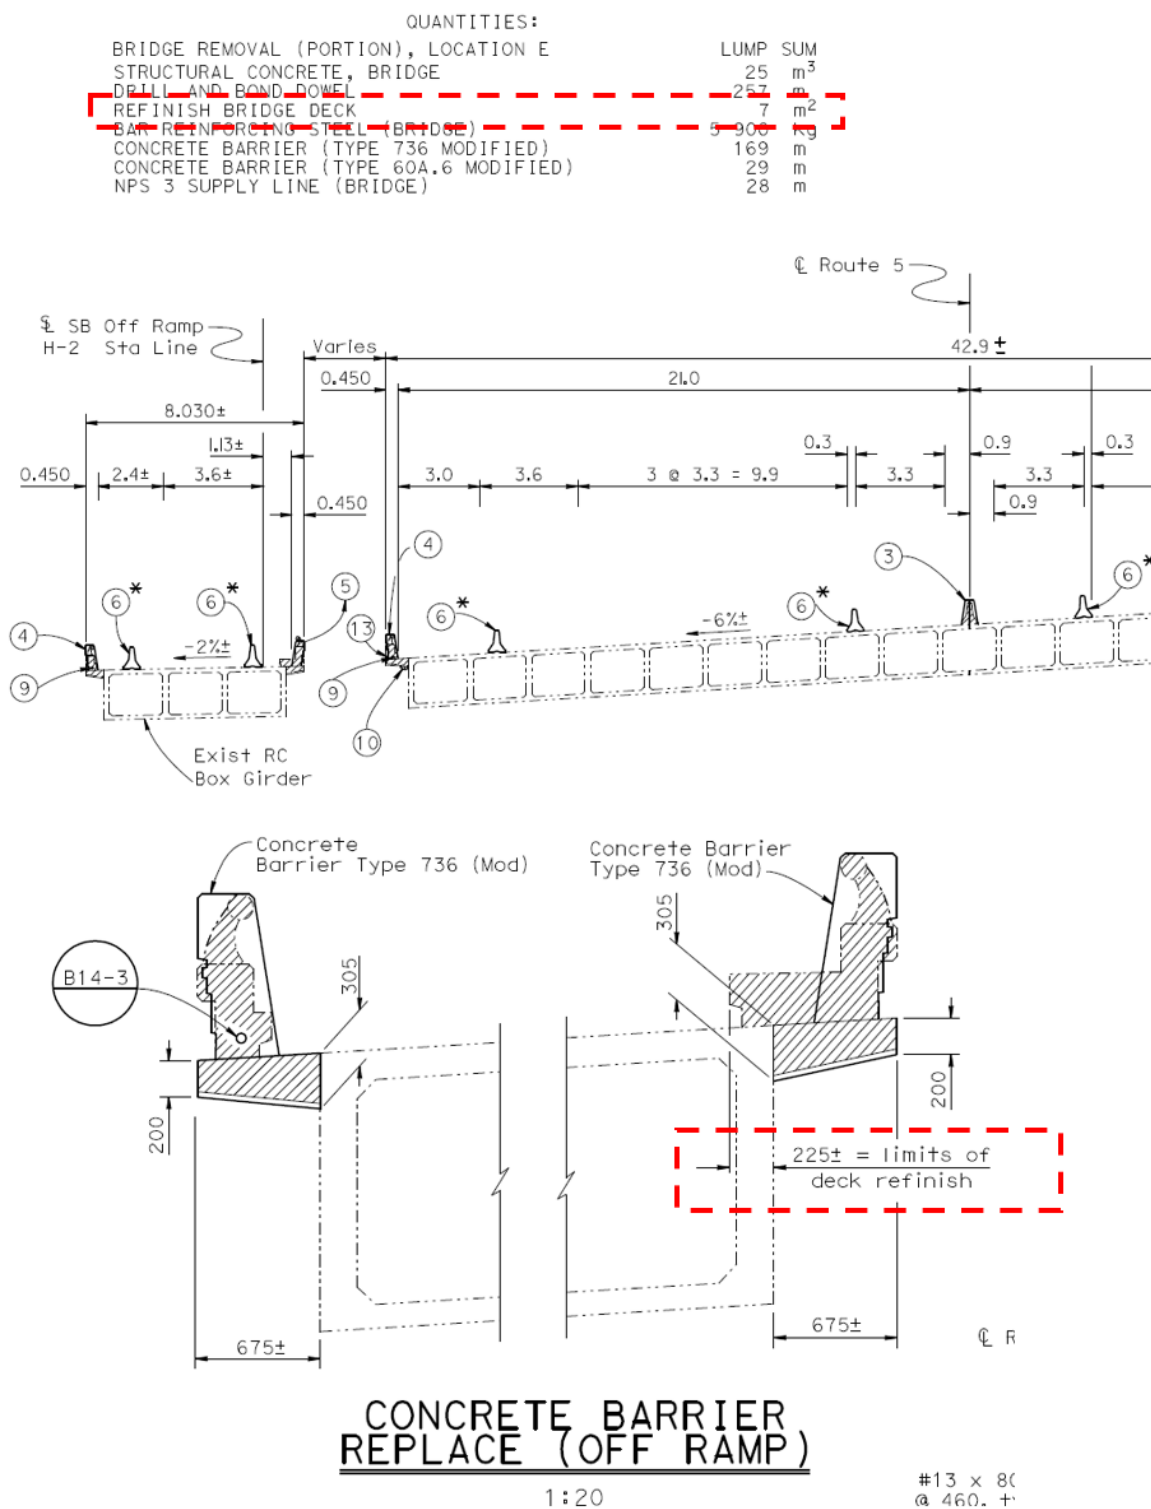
Contract Plan Showing Limits of Deck Refinish
